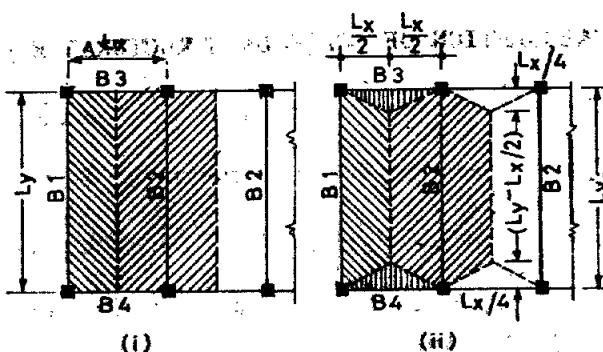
(c) Loads on Beams supporting One-way Slabs
